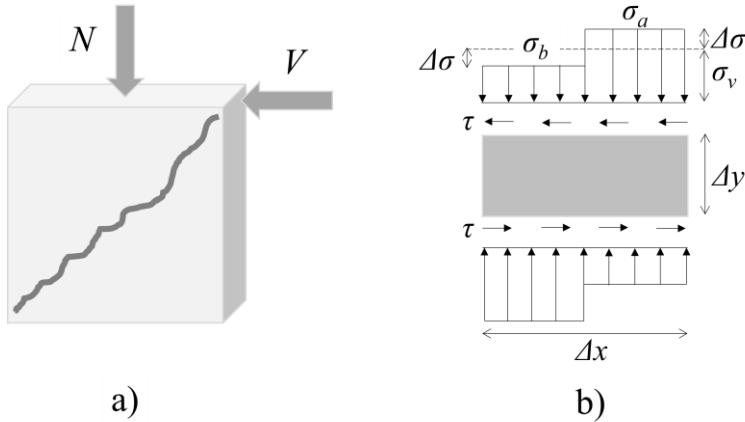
a) URM pier under in-plane shear masonry wall, b) single block
